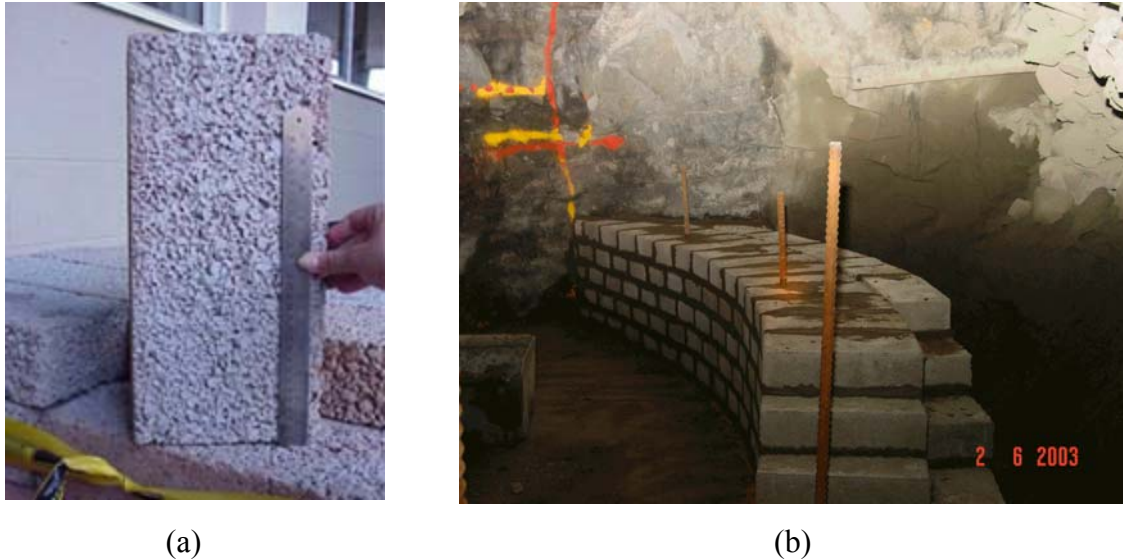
(a) A brick used in the construction of barricades (b) A barricade wall under construction
